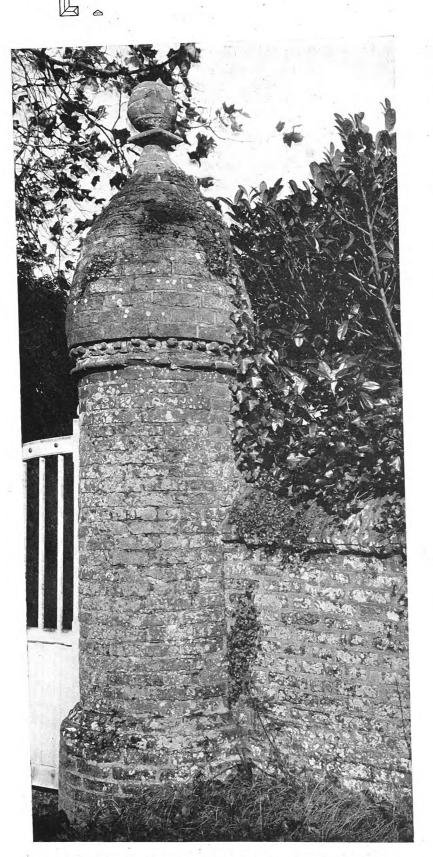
DETAIL OF DUTCH BOND WALL AND COPING BRICKS AT "FINCH DEN," TENTERDEN.
